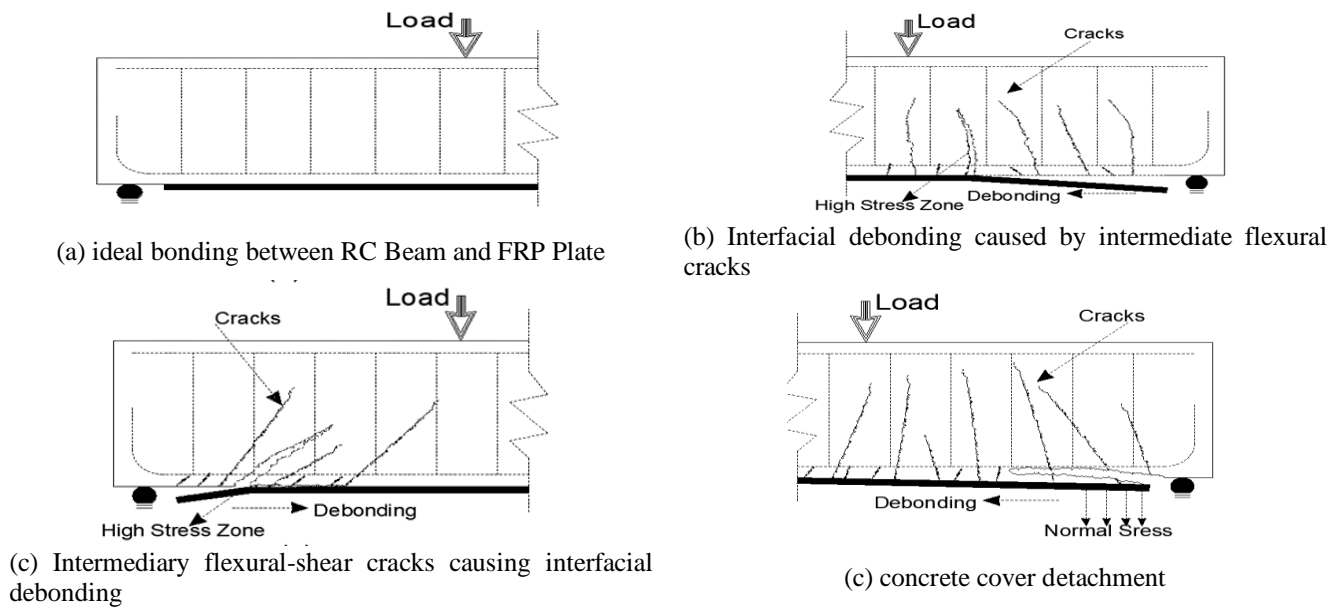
Typical forms of debonding failures in beams reinforced with FRP
